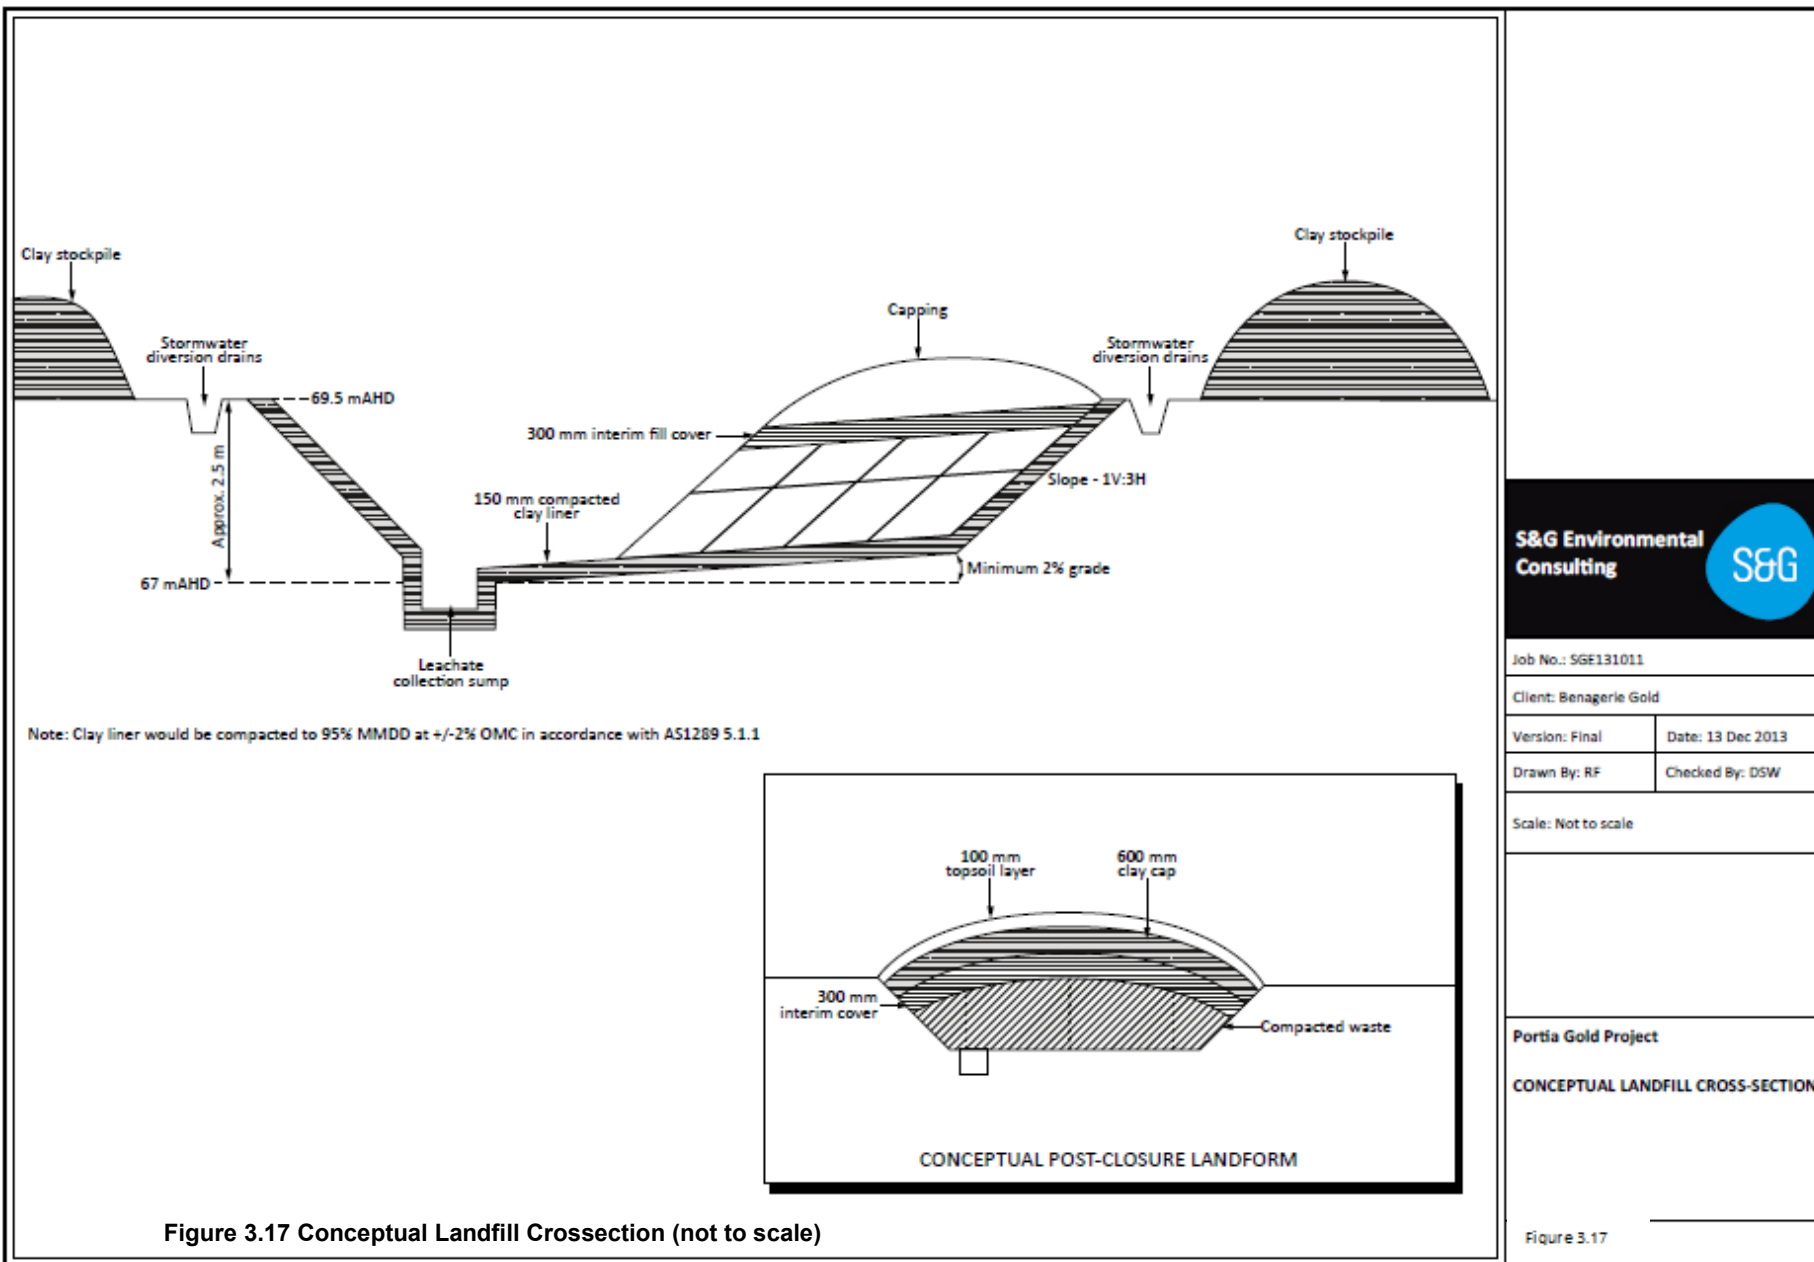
Conceptual Landfill Cross-section (not to scale)
